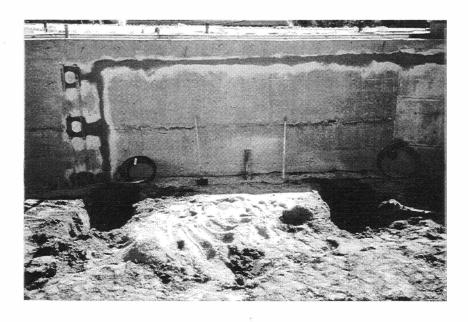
Total Pressure Cells Installed in Back of Abutment Wall
